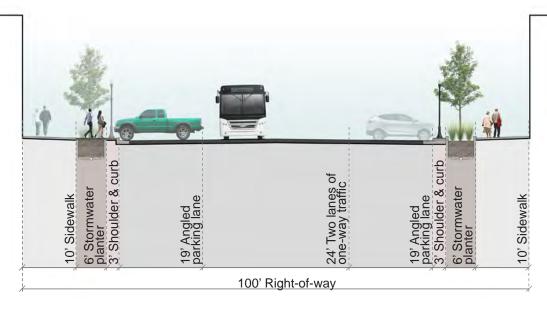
Typical section of what South Pierre Street could look like with stormwater planters, street trees, and bike lanes.
